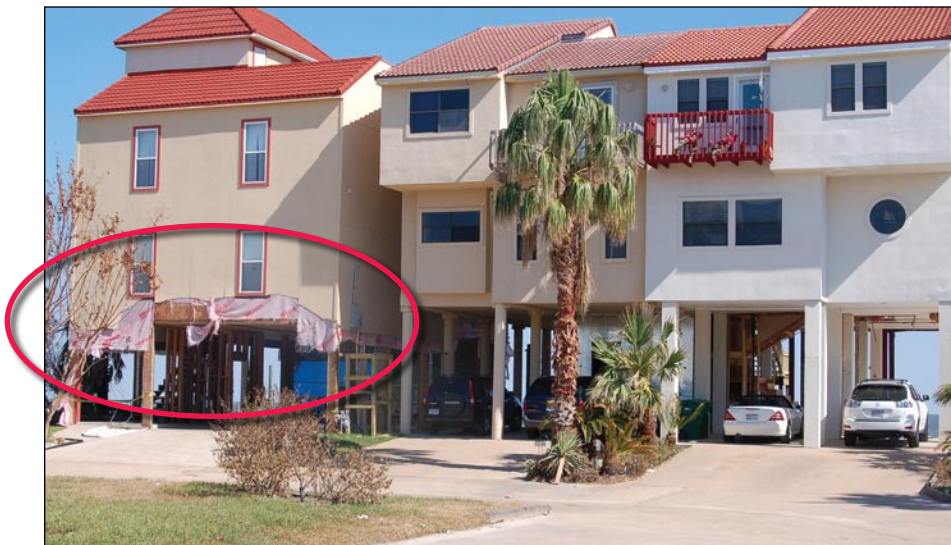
Propagation of damage above lowest floor when breakaway walls broke free (Seabrook, TX)
